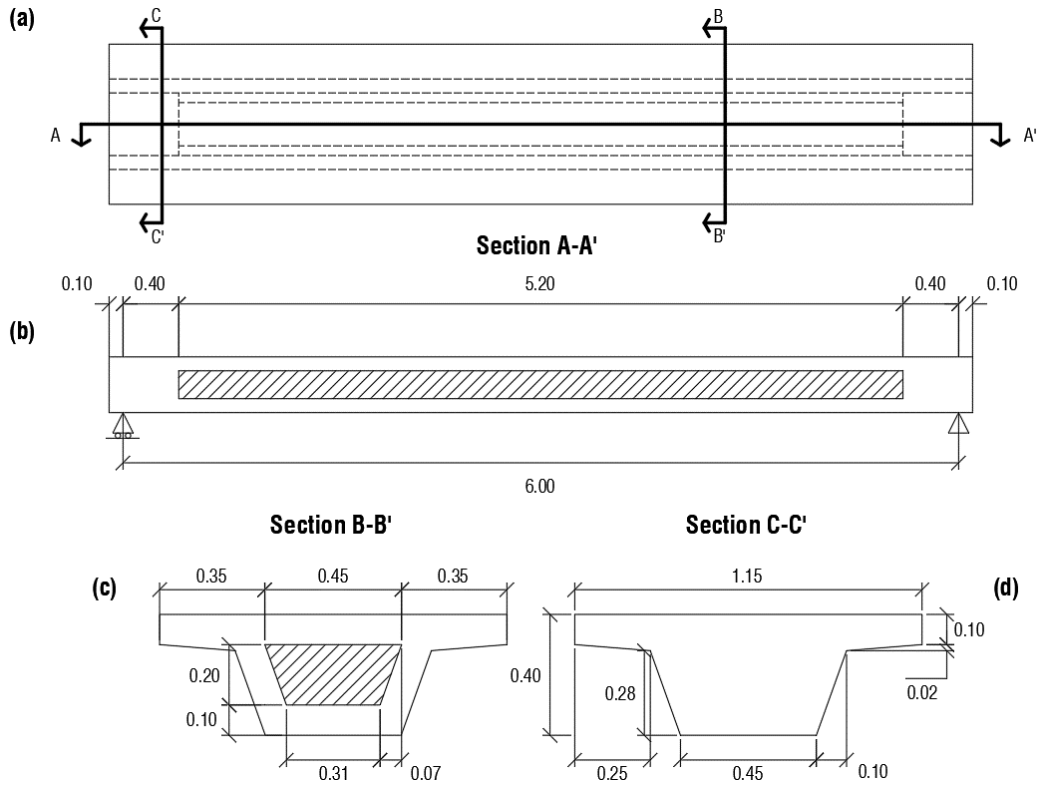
Geometry of lab-tested scaled PSC box bridge: (a) Top view, (b) Longitudinal section A-A', (c) Hollow cross-section B-B', (d) Solid cross-section C-C'.
